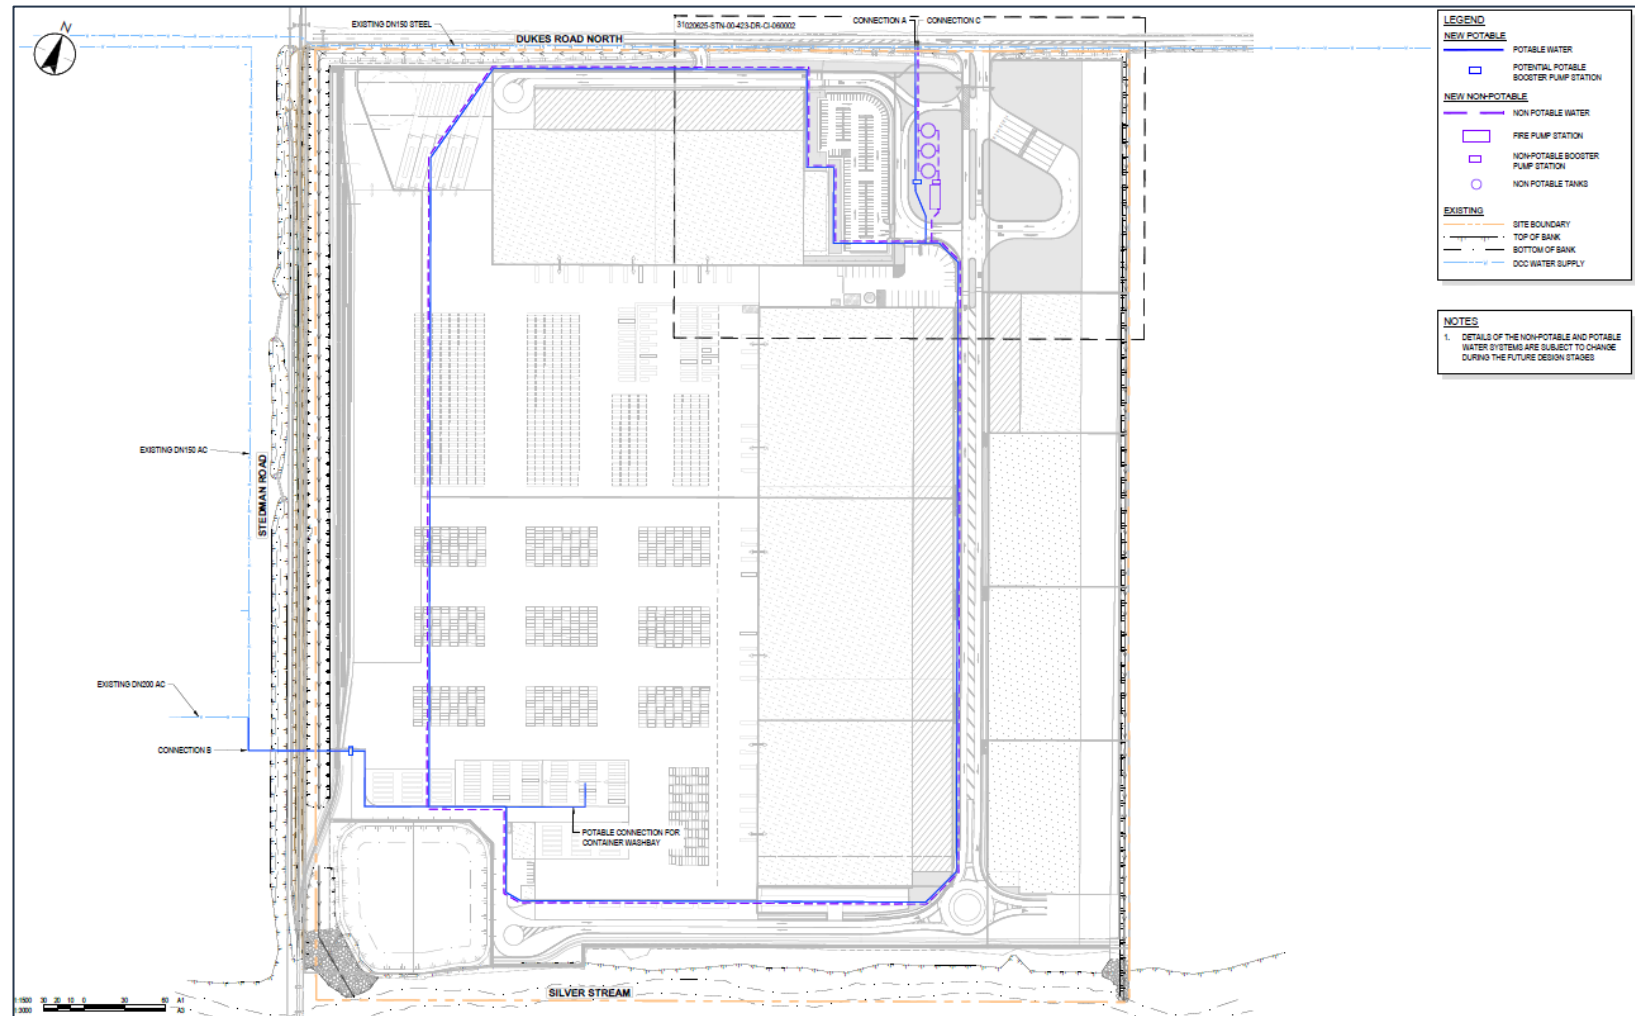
Proposed Potable and Non-Potable Water Supply Network Layout
